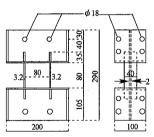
Dimensions of shear panel made of low-yield-point steel (unit: mm)
